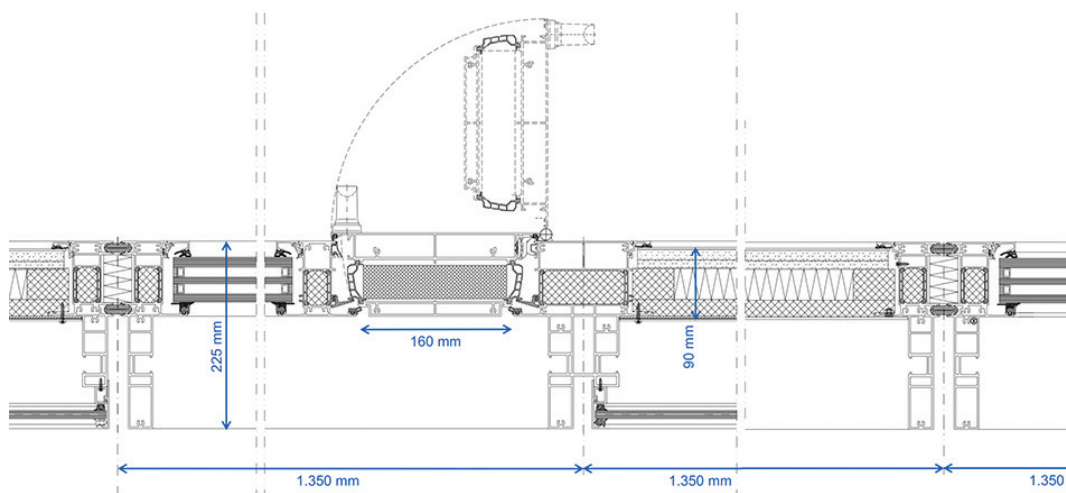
Façade with BIPV horizontal section | fixed glazing with opening sash (left) – specific panel build-up (right)
